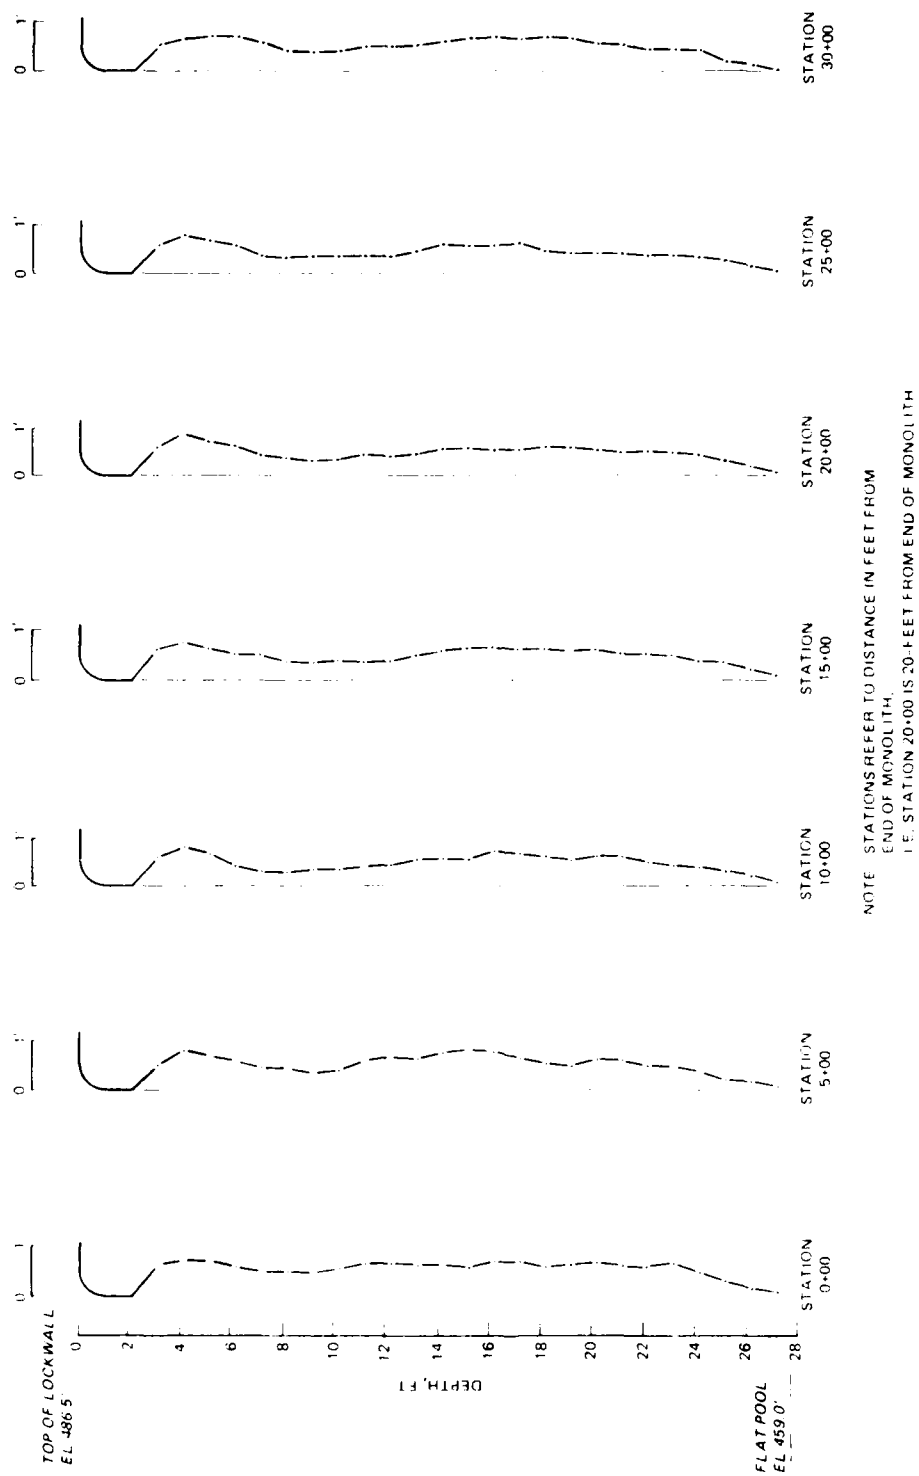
Cross section of monolith 31, 1973, Marseilles Lock
